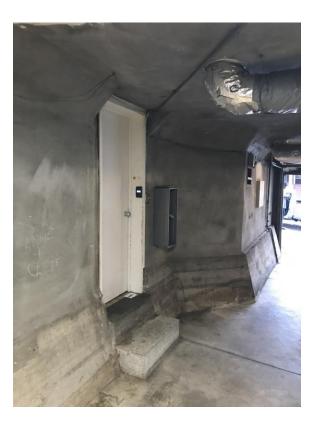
Garage Wall Opposite Entry and Interior Stairwell
